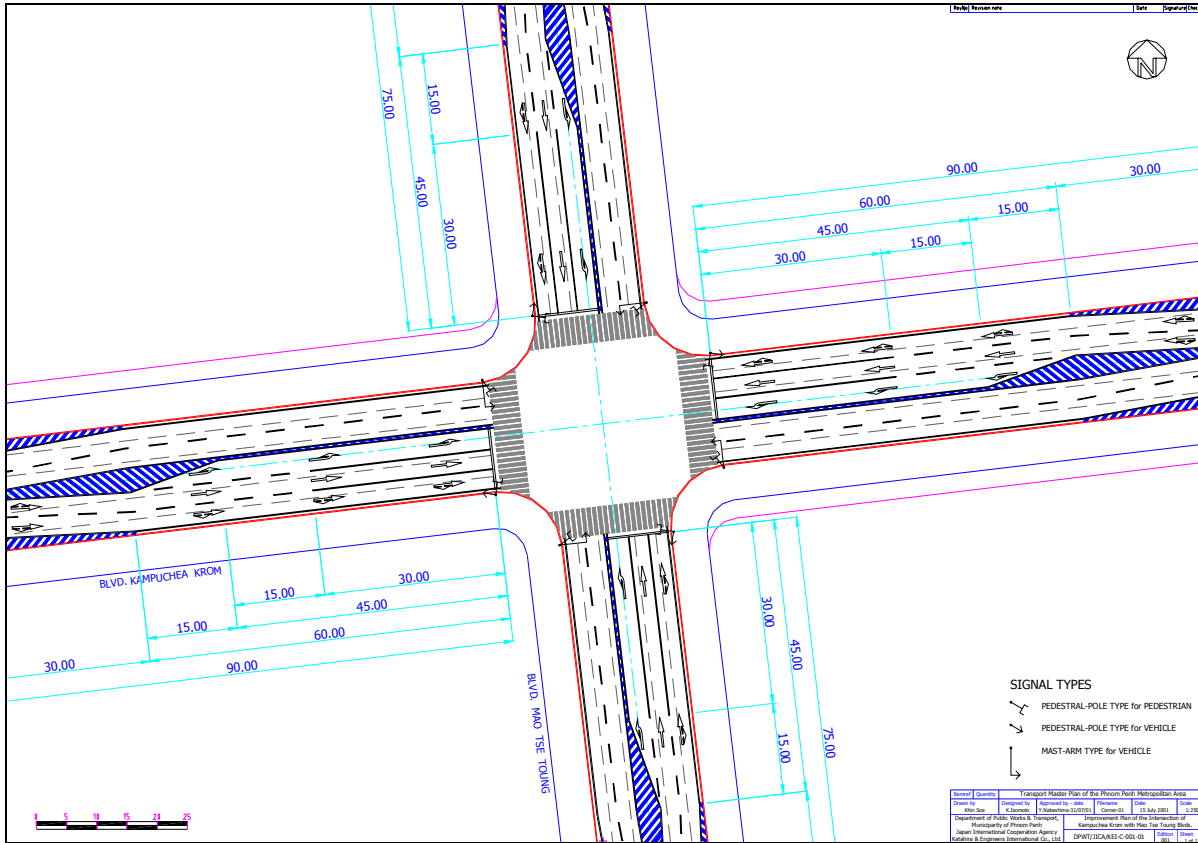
(1): Standard Design at Kampuchea Krom Blvd. / Mao Tse Toung Blvd.
